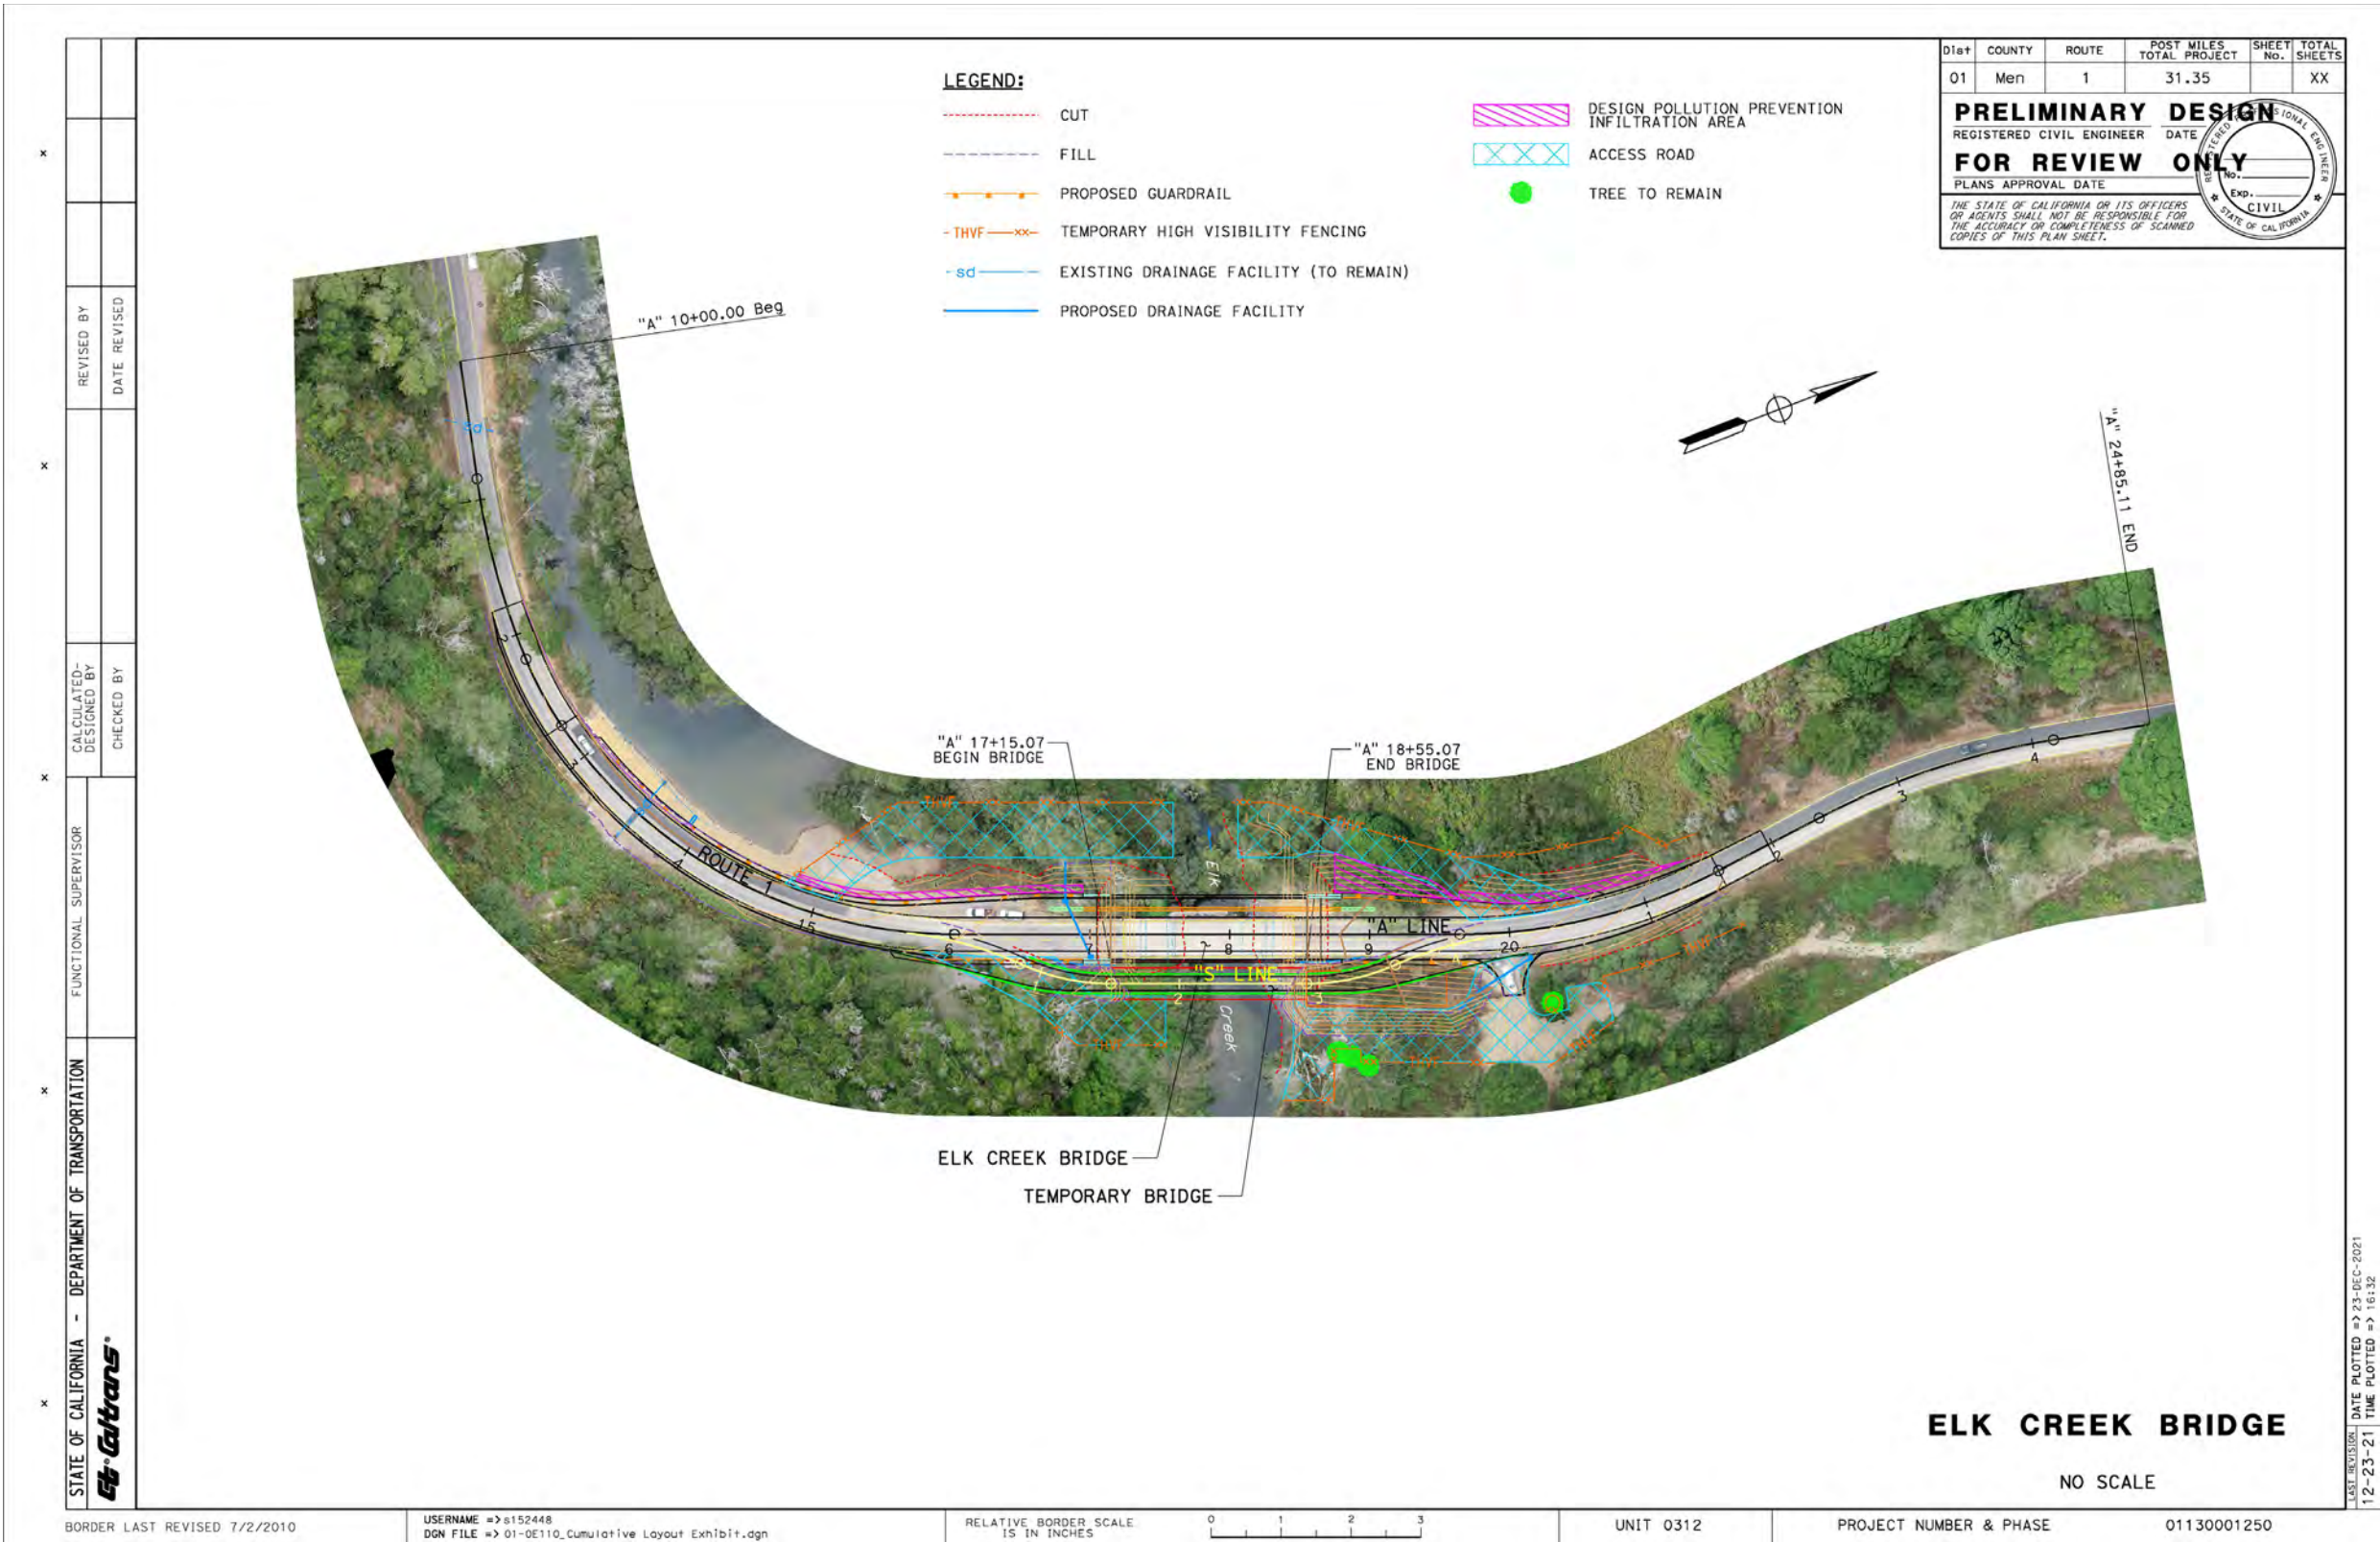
Anticipated impacts to riparian habitats and coastal brambles from access roads, new bridge abutments, and temporary bridge construction.
